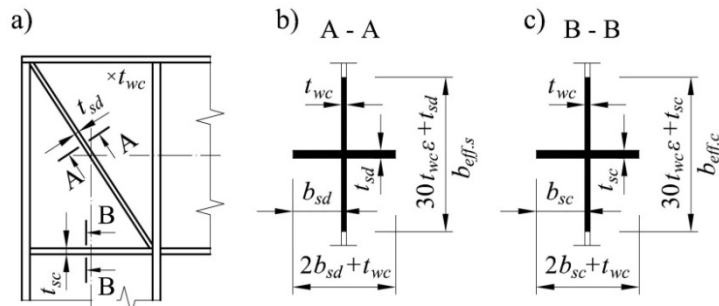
Stiffeners of the knee joint: a) strengthening in the form of transverse and diagonal stiffeners, b) stiffened cross-section of the shear zone, c) stiffened cross-section of the compressed zone
